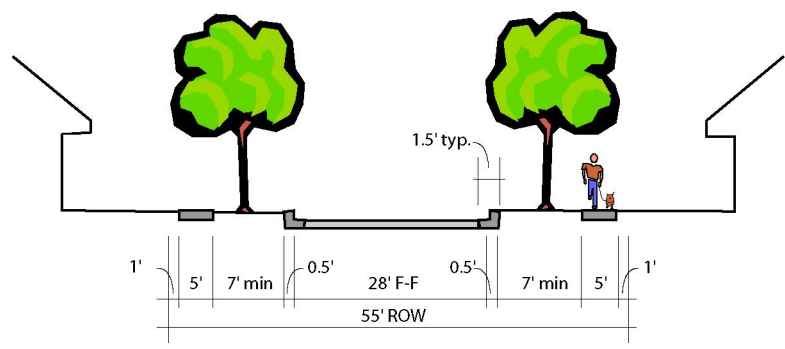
Schematic sketch of a typical minor street cross-section with two-sided parking.
